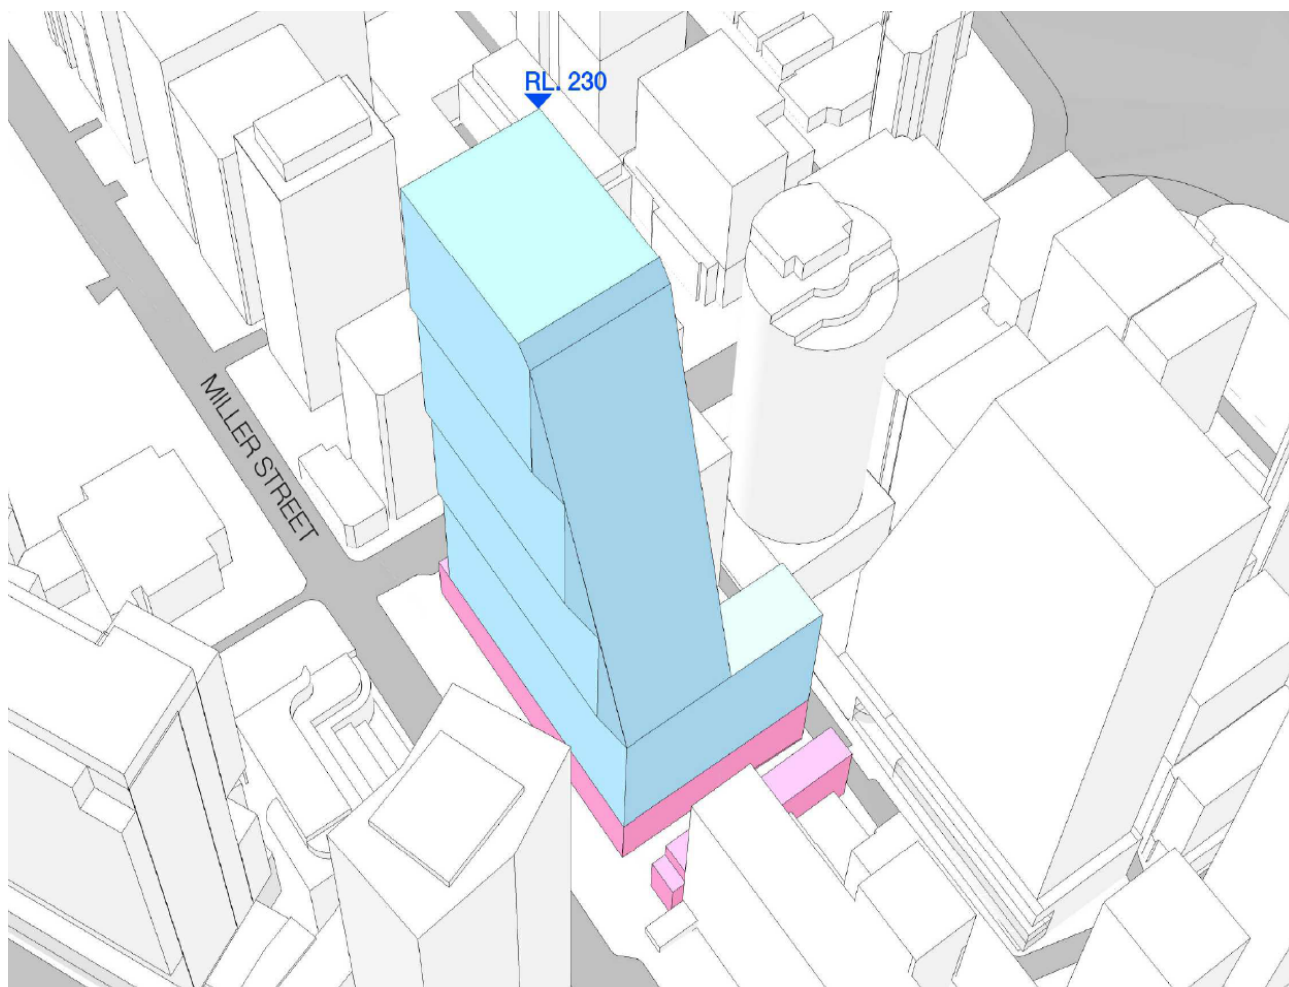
Proposed Victoria Cross OSD building envelope (axonometric diagram from southwest)
